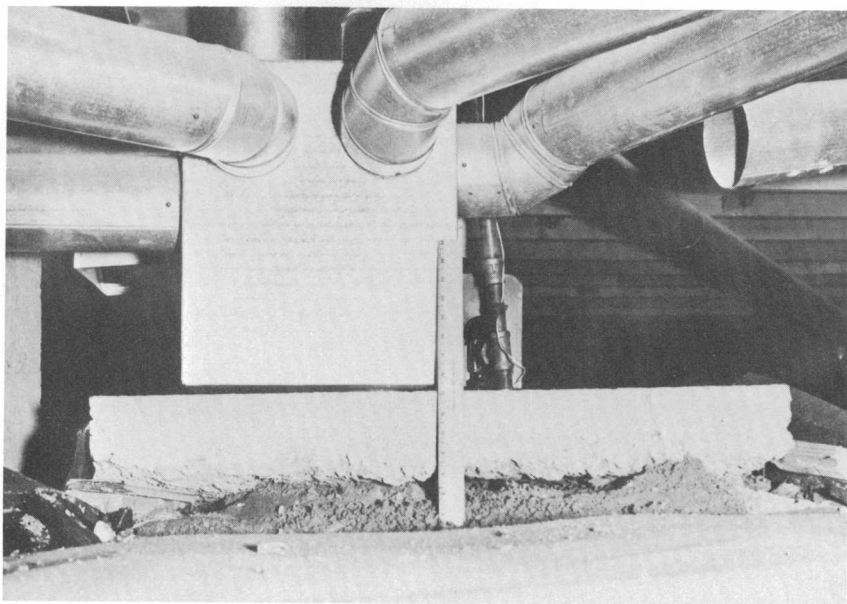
Uplift of concrete pad beneath furnace under house in Mountair subdivision, 2100 block 27th Street, Pueblo, Colo., caused by swelling clay in transition member of the Pierre Shale. Pipes attached to furnace are bent where they were forced upward against floor joists. Uplift exceeds 3 inches. Pad formerly sat at level of impermeable paper in foreground. Scale is 15 inches long. Photograph from inspection Division, Pueblo Department of Public Works.
